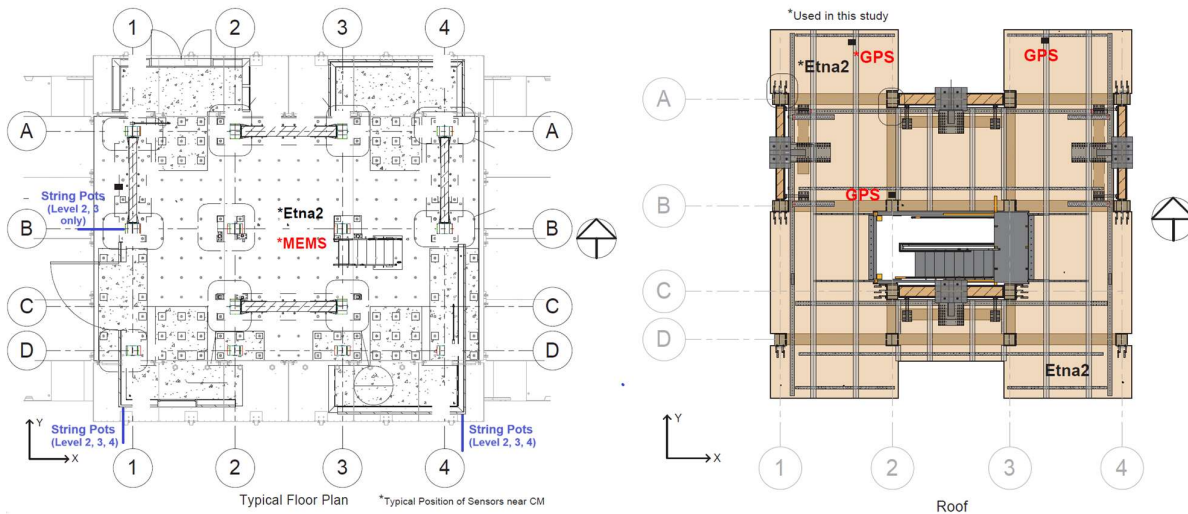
Floor plan a) Typical b) Roof (Adopted from NHERI Tallwood Layout)
